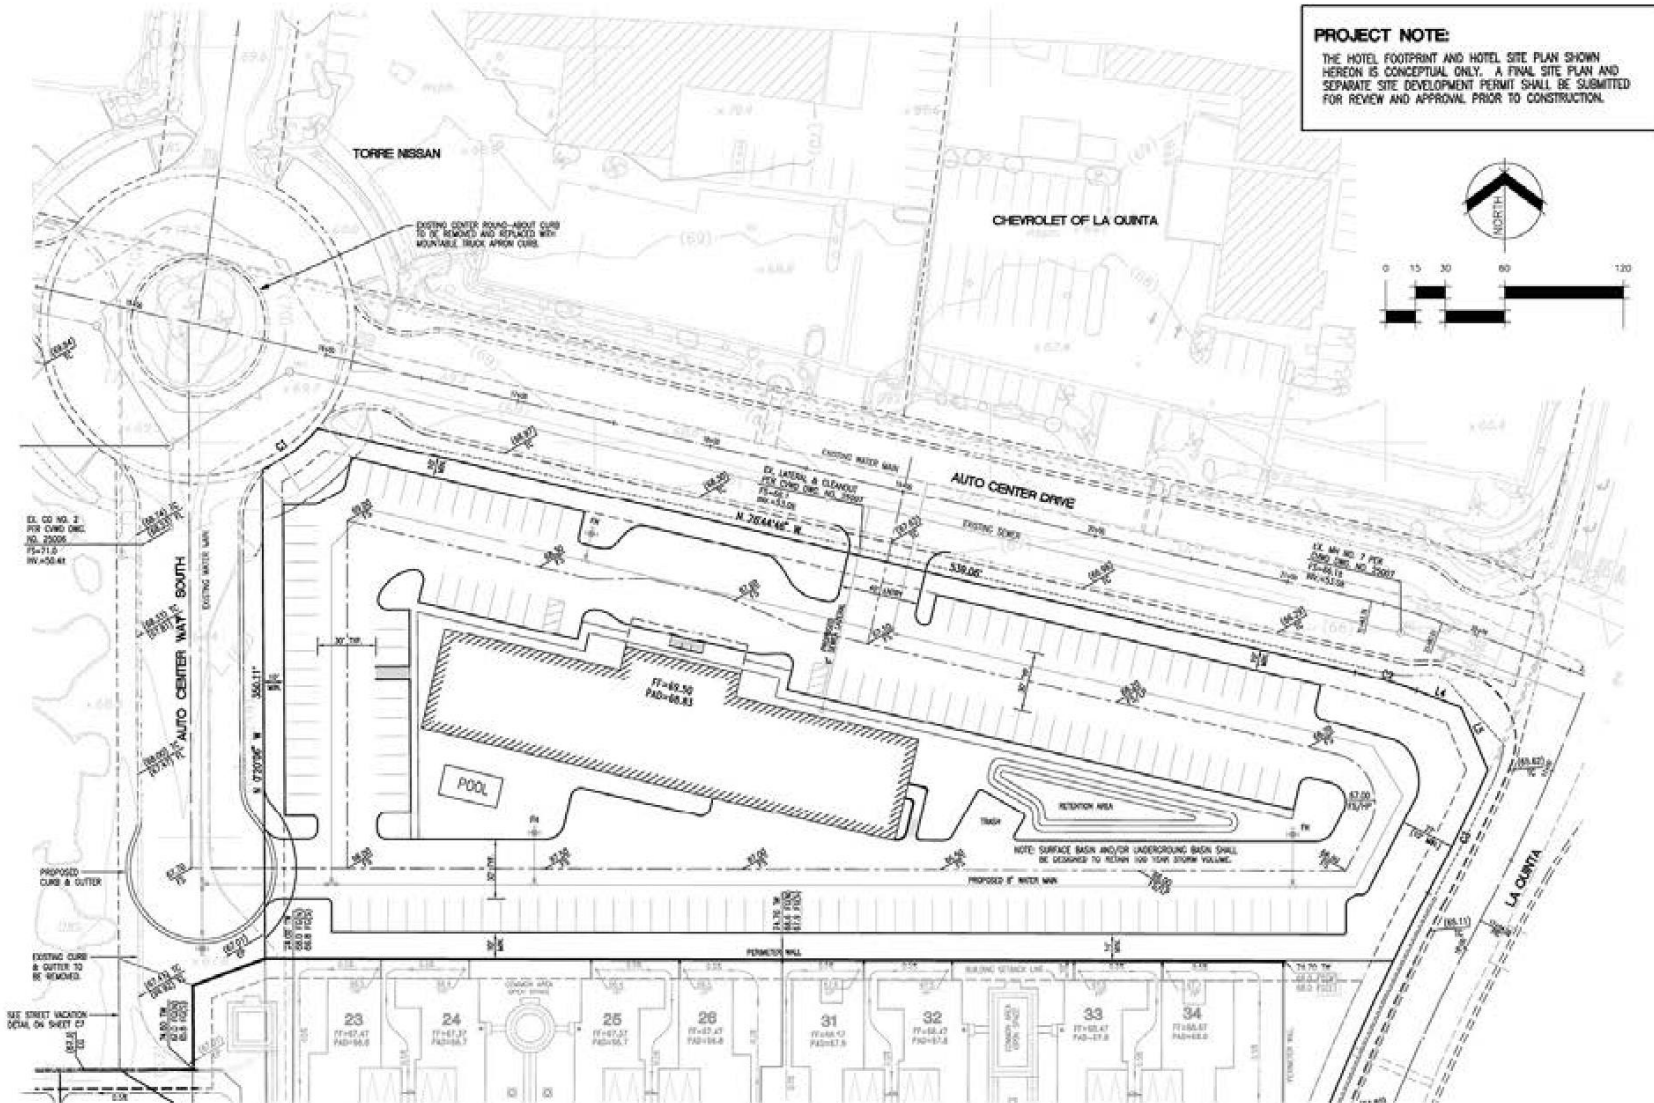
Conceptual Commercial Parcel Site Plan per Specific Plan Section 2
